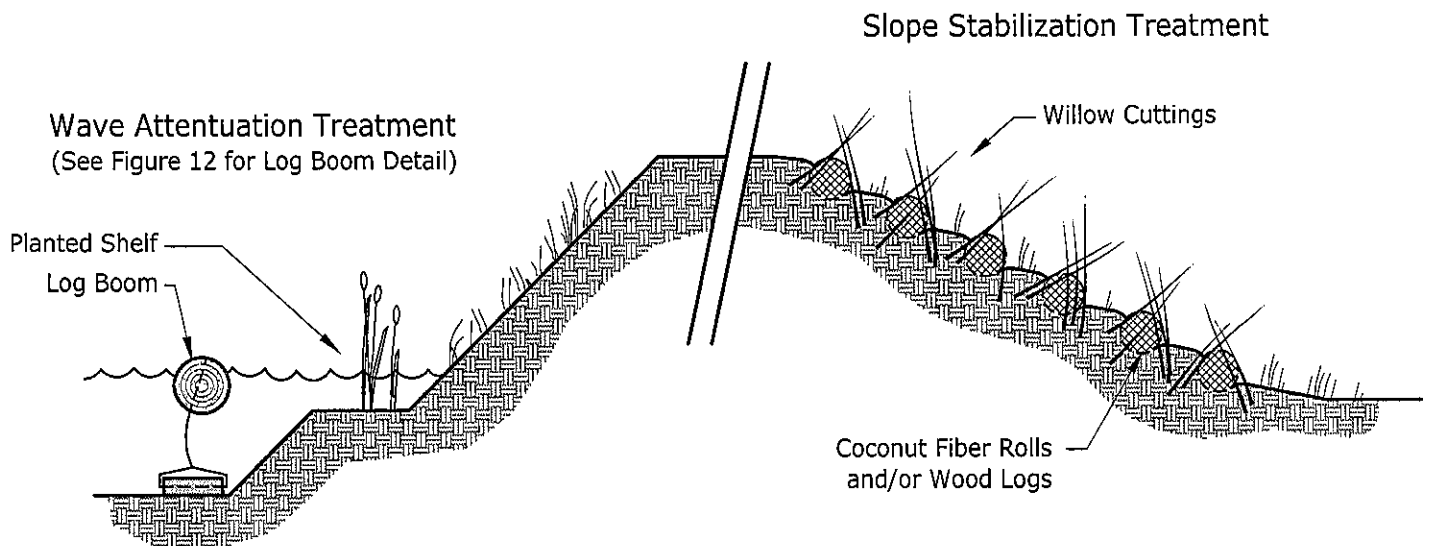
Typical Levee Repair Cross Section - South and East Levees
